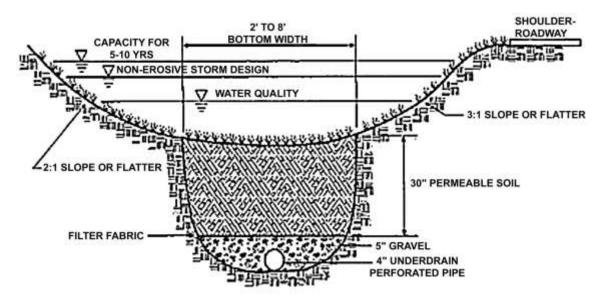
Dry Swale Cross Section (Cited by Barr Engineering Co., 2001, Source: Center for Watershed Protection, 2000)
